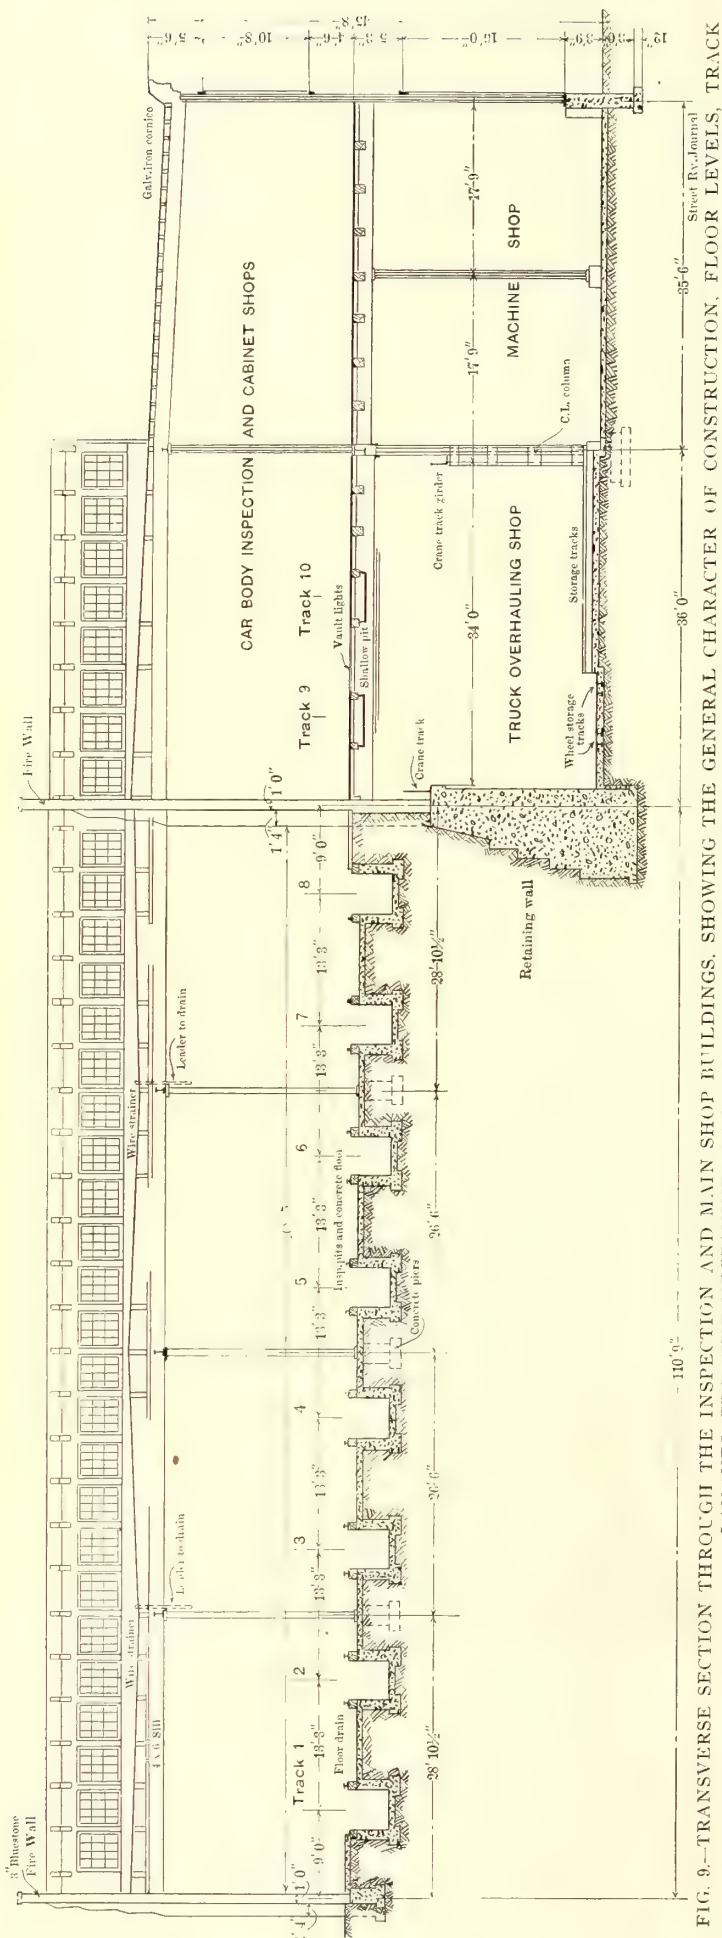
TRANSVERSE SECTION THROUGH THE INSPECTION AND MAIN SHOP BUILDINGS, SHOWING THE GENERAL CHARACTER OF CONSTRUCTION, FLOOR LEVELS, TRACK LAYOUTS, ETC. THE MEZZANINE FLOOR OF THE SHOP BUILDING IS NOT SHOWN ON THIS SECTION
